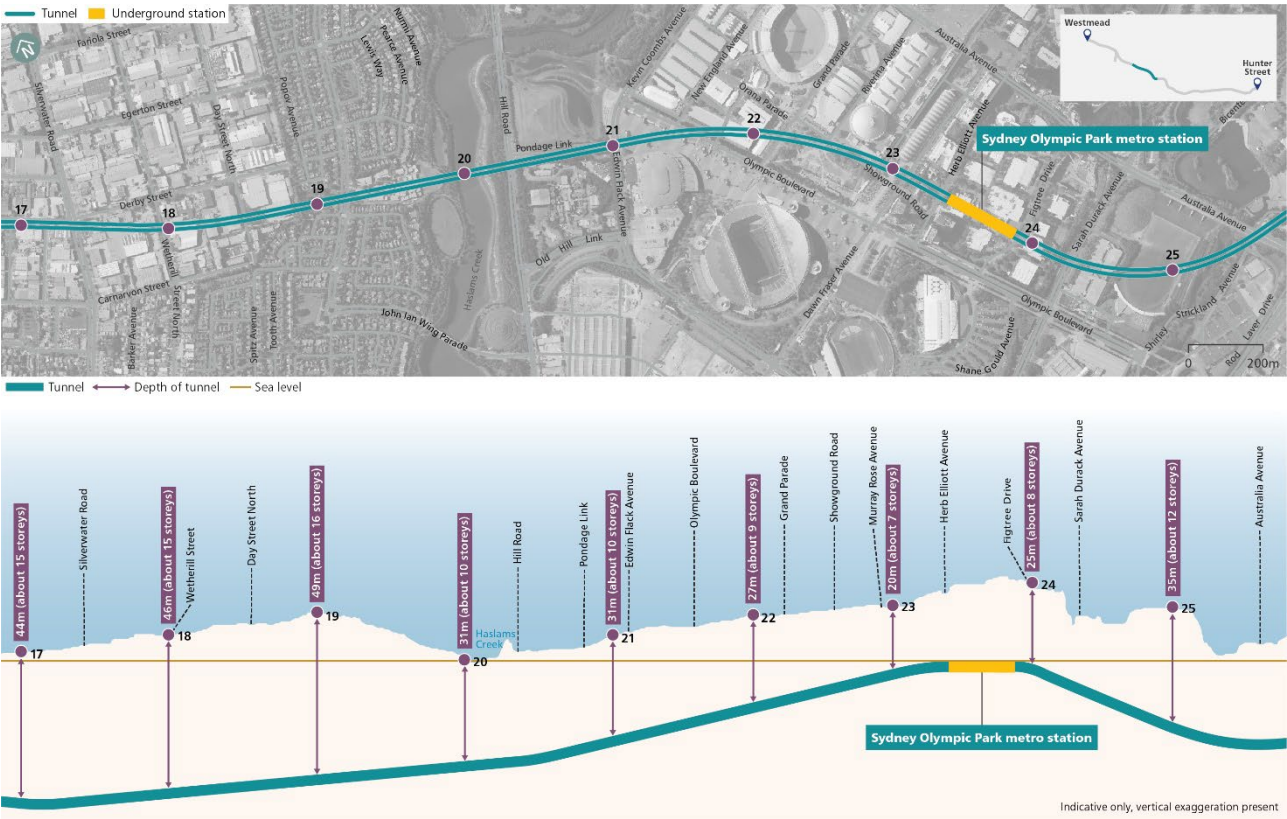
Indicative alignment plan and long section (3 of 8)
